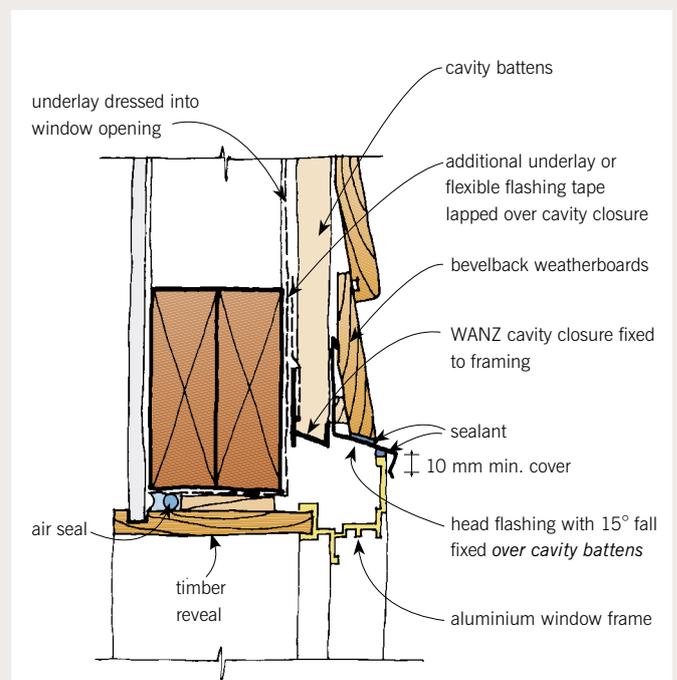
WANZ WIS detail of window head flashing with cavity-fixed, bevelback weatherboards.
